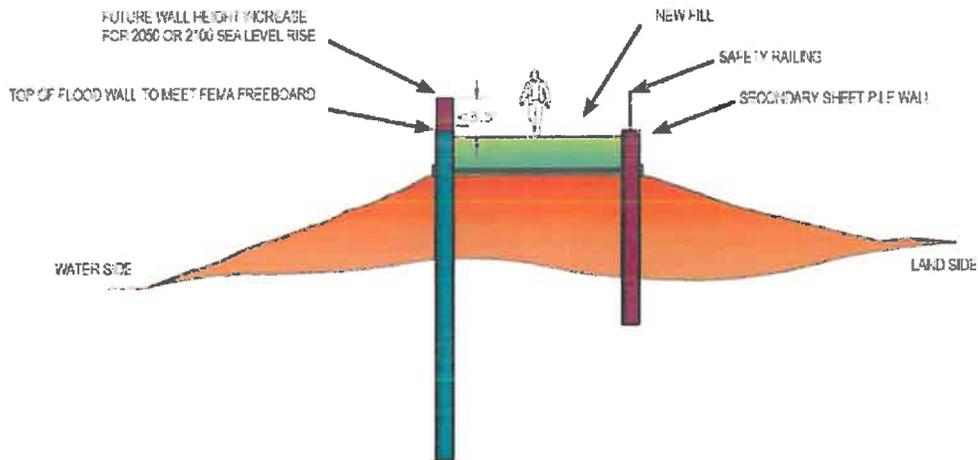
Double Sheet Pile Floodwall Levee Improvement Type
